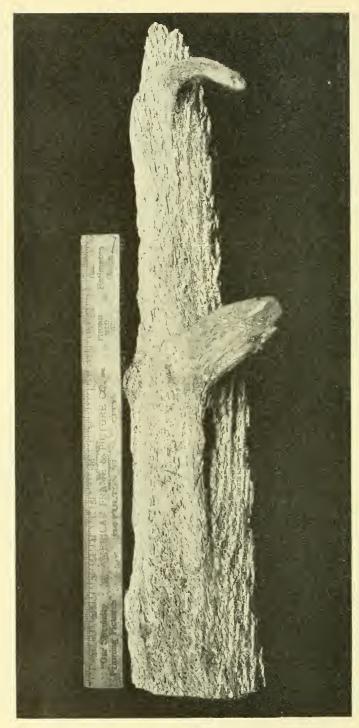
Section of Pile Driven in Grand Trunk Rr. Pier at Portland, Maine, Showing Limnoria Attack. Pier Drstrome et Borers
